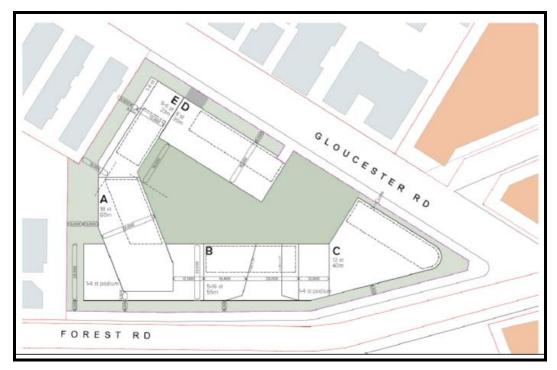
Concept Master Plan (Source: HDCP No 2 - Figure 2, Section 8.3.2.2)
